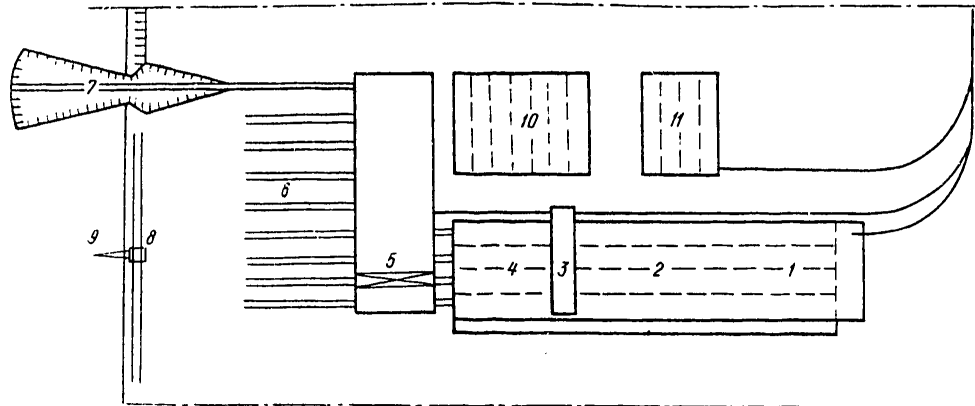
Master plan layout of the main facilities of a Class IV shipyard. 1, 2, 4--shop module (steel storage; shops: hull platers, assembly-welding, assembly of modules and shipbuilding shed); 3--small conveyor; 5--large conveyor; 6--area for winter storage of ships; 7--longitudinal slip; 8--outfitting quay; 9--water; 10--makeup and machine shop module; 11--storage area module.
